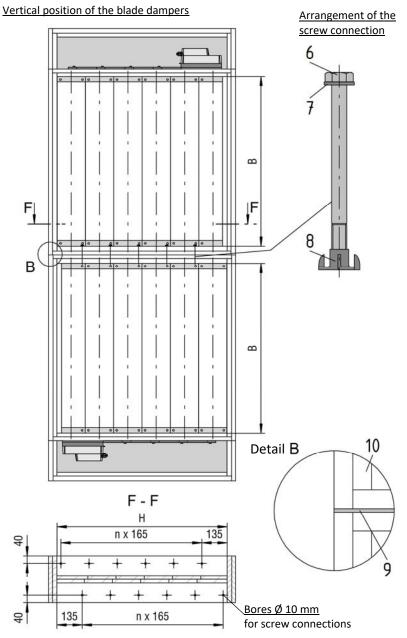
Installation of the ERK-MB-V dampers above each other with vertical blade dampers
